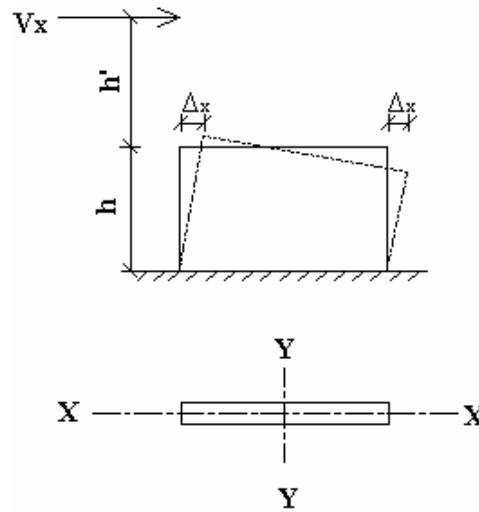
Deflection of cantilever shear wall subjected to lateral load
